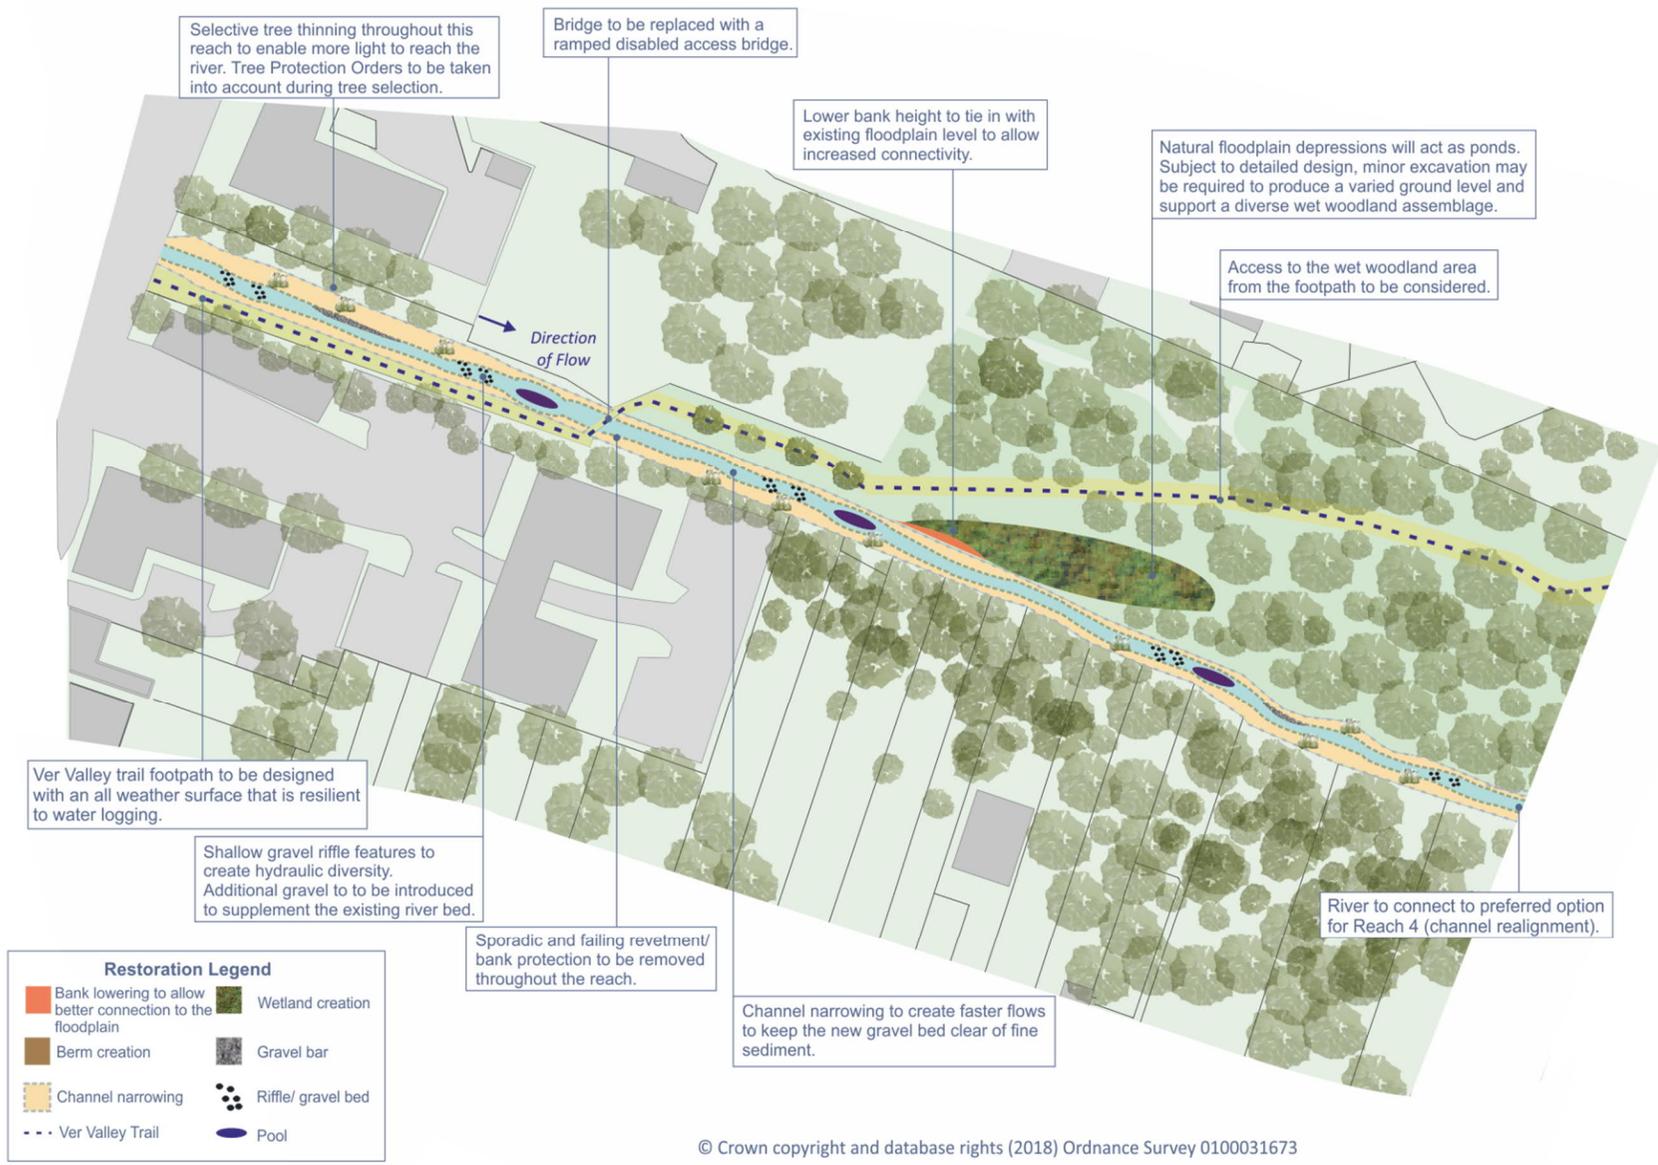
Reach 3 Final Outline Proposal Plan (post engagement)
